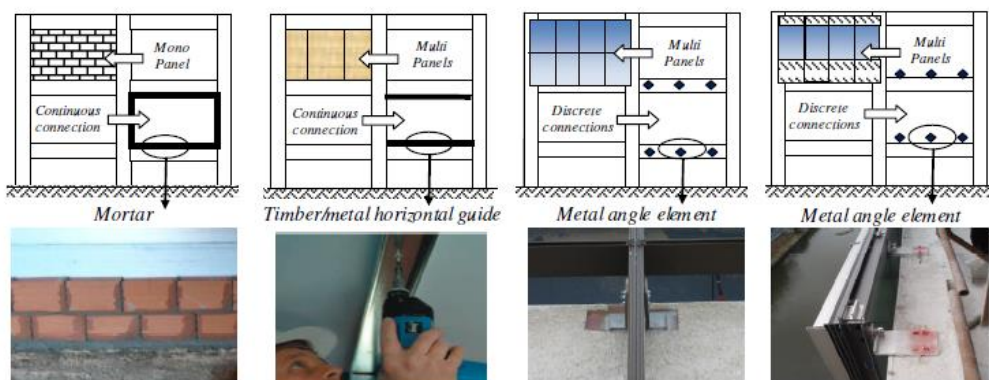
Classification of facade systems (A. Palermo et al, 2010)
